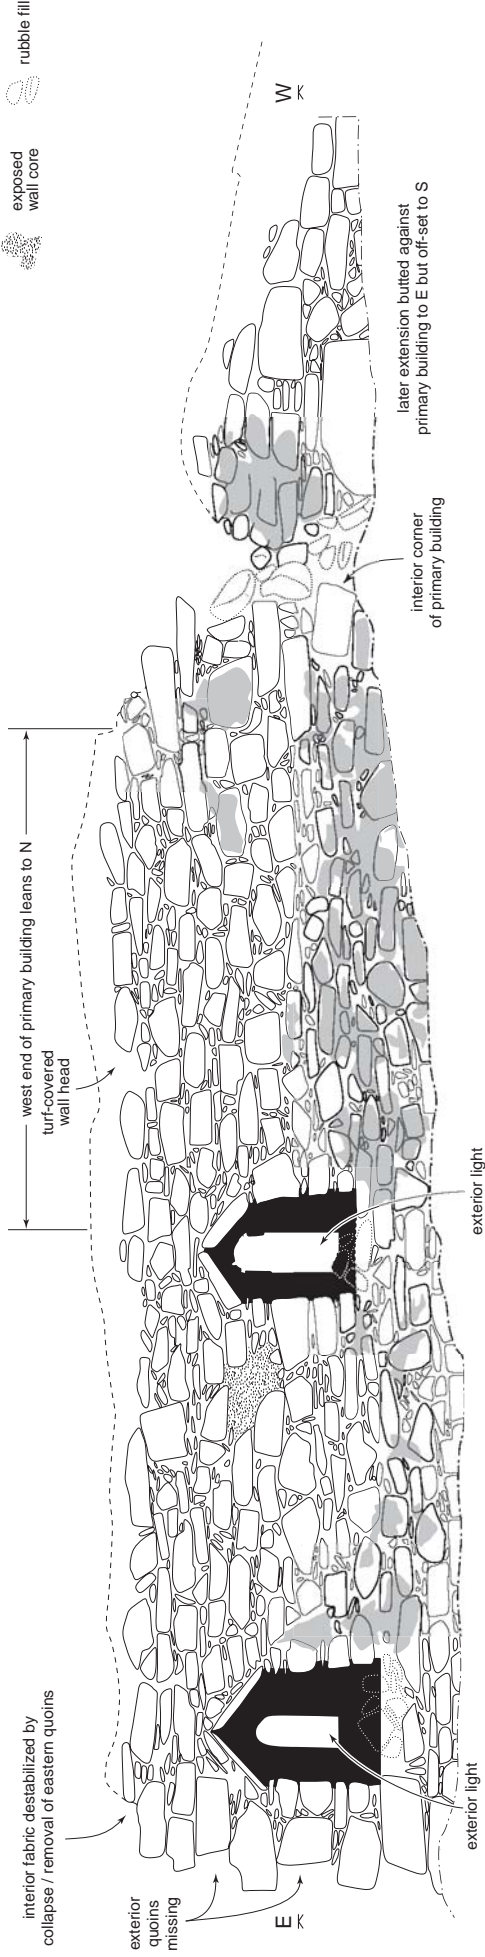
Cille Bharra graveyard: Detailed plan of structures.
